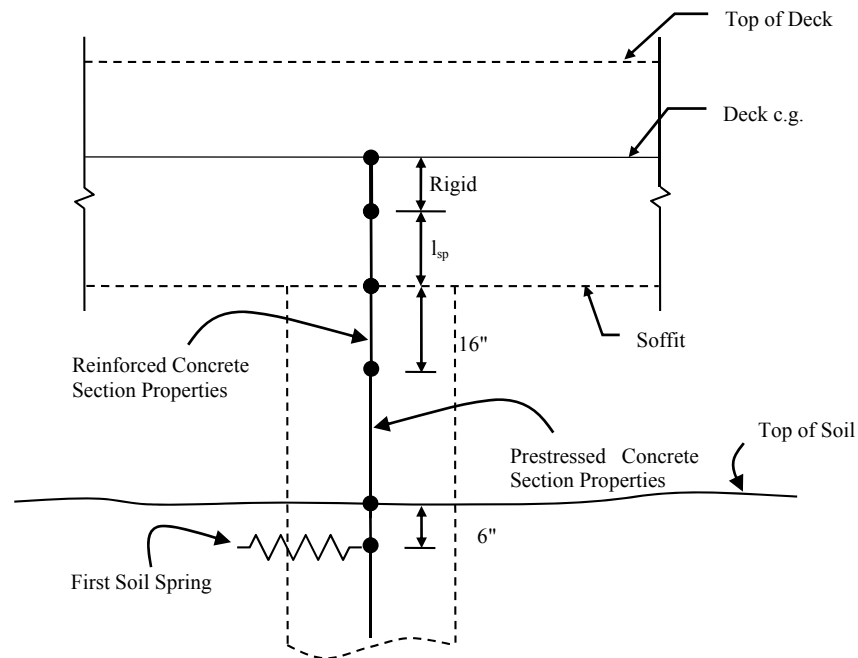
Pile-Deck Structural Model Schematic Showing Strain Penetration Length
